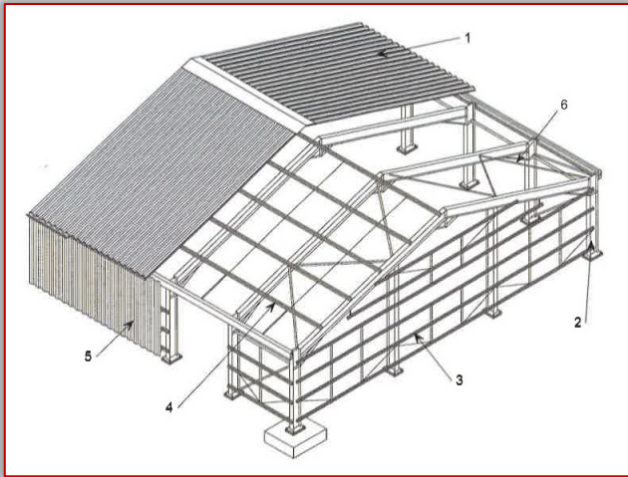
Basic structural elements of the steel hall for carrying "sandwich" facade panels [6]
